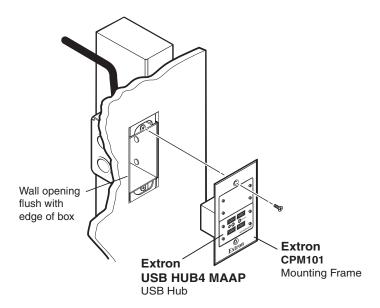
Installing a USB HUB4 MAAP in a One-gang Wall Box
